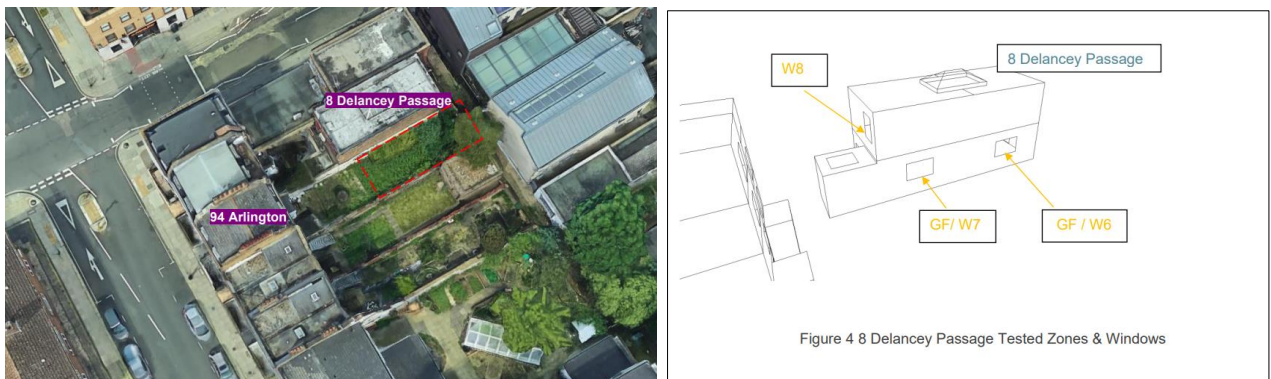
Extract from Daylight/Sunlight Assessment showing location of windows
